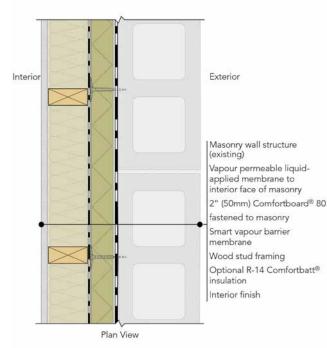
ROCKWOOL Comfortboard installed on the interior of an existing CMU construction, with optional batt insulation installed between a wood frame
